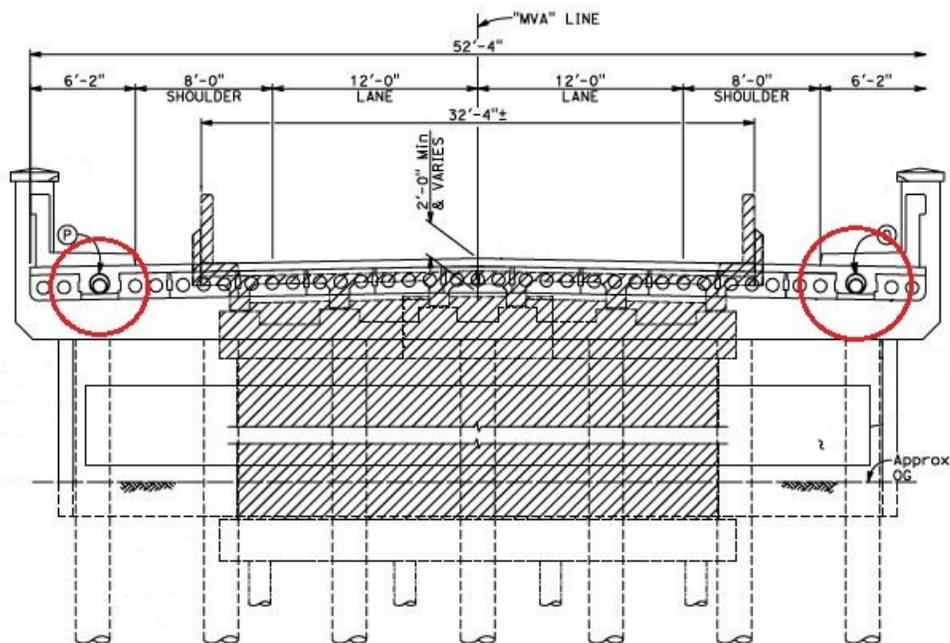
Typical Bridge Cross-section with Utility Casings Indicated
